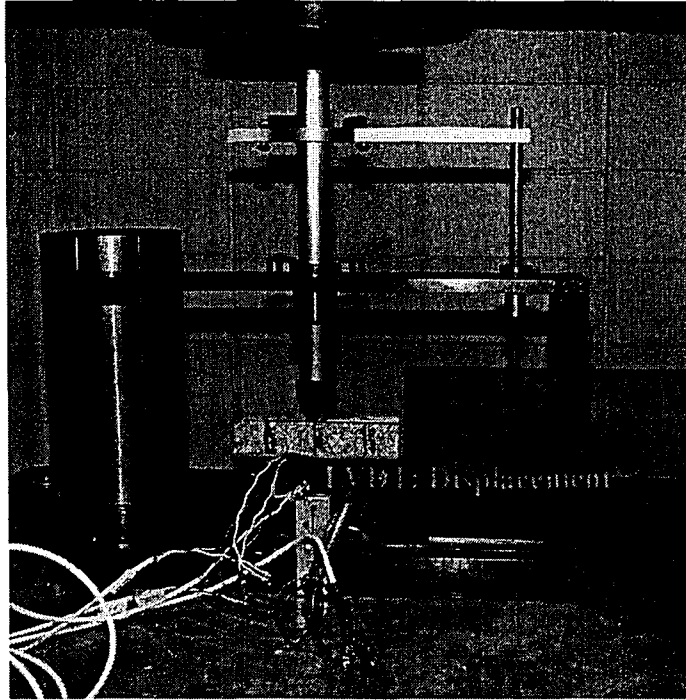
Actual Loading Fixture for Static CMU Tests
